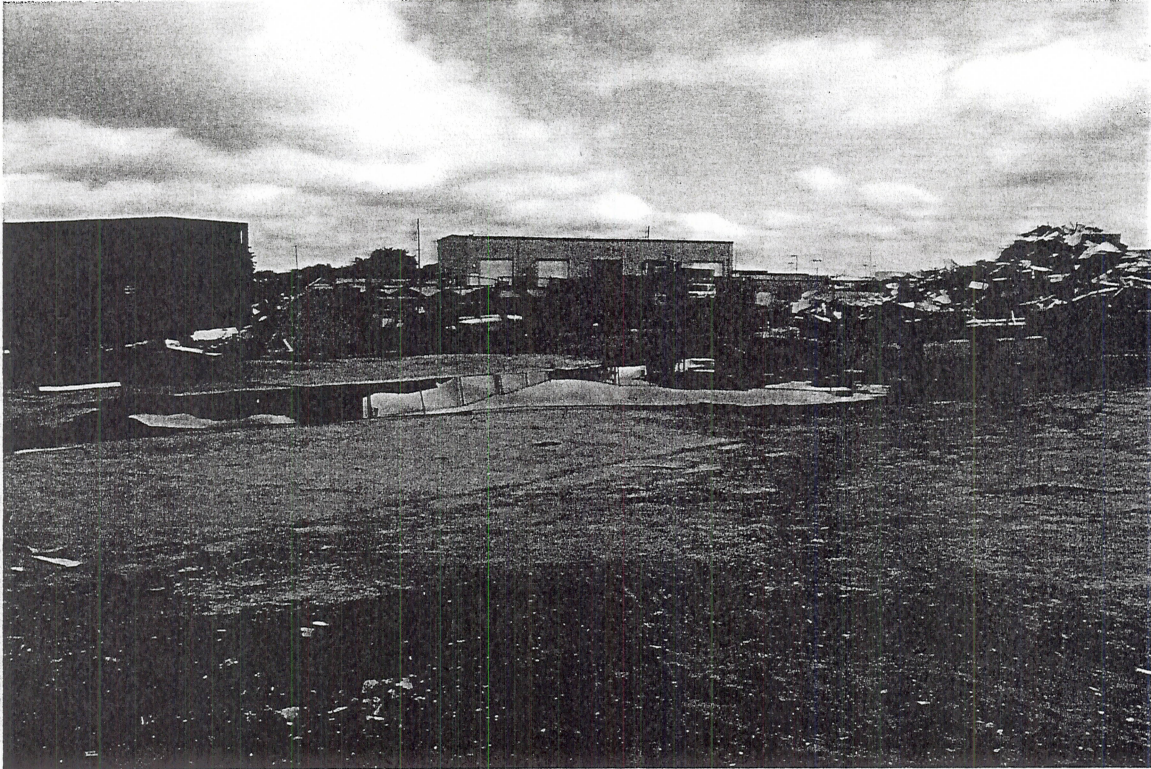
Standing water over LF-1. Note low spot due to settlement of waste mass.
